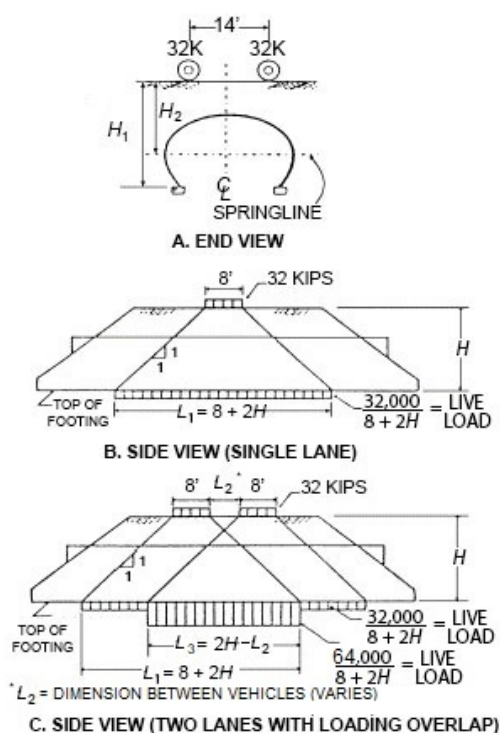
Live-Load Footing Reaction Due to Axles of the Design Truck, per Footing
